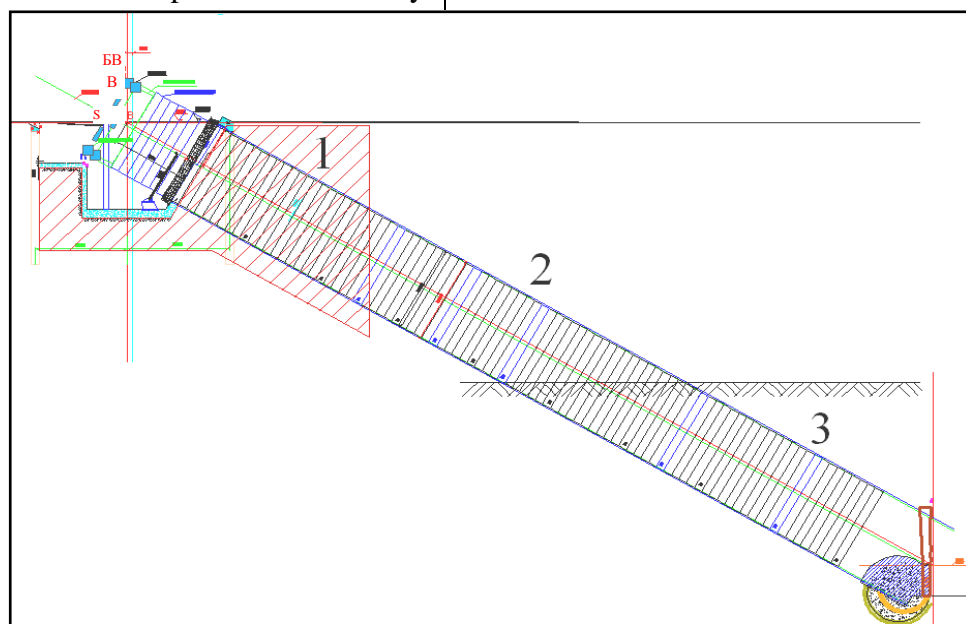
Provisional sectioning of the massif during construction of the escalator tunnel at the Spasskaya underground station (in accordance with subsidence rate).
